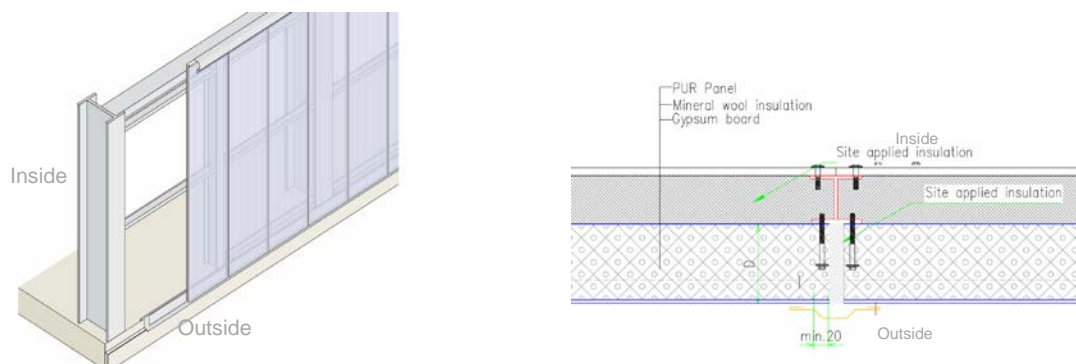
IS_02_a Construction method and detail of panels on a frame structure (Kingspan Construction Details 2017)
